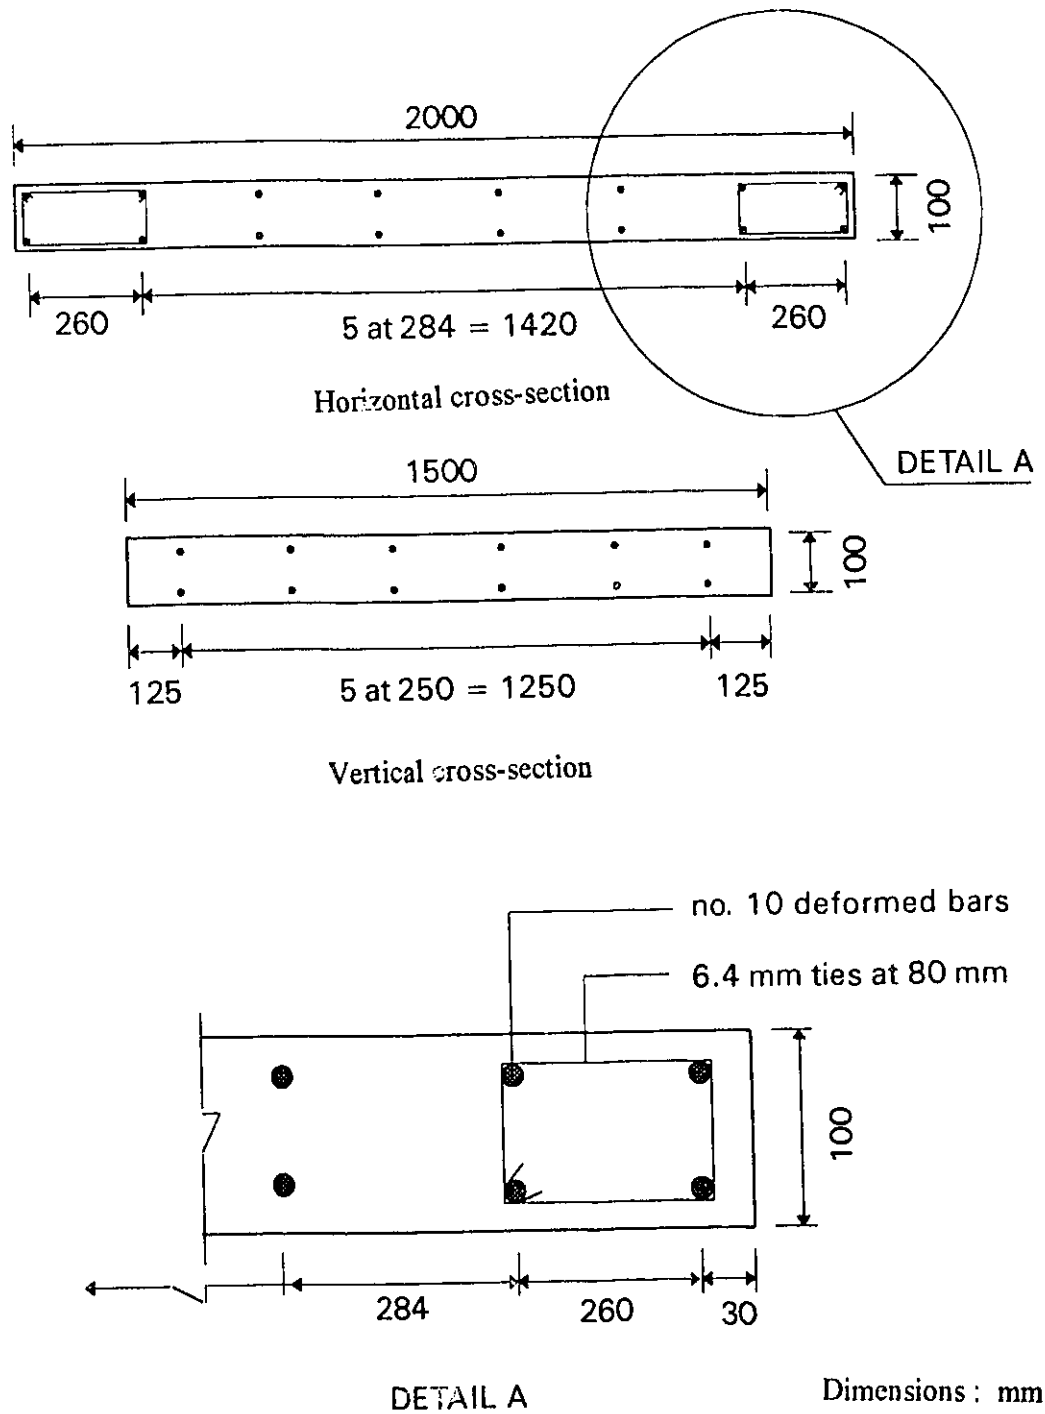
Horizontal (above) and Vertical (below) Cross-Sections of Wall 7
